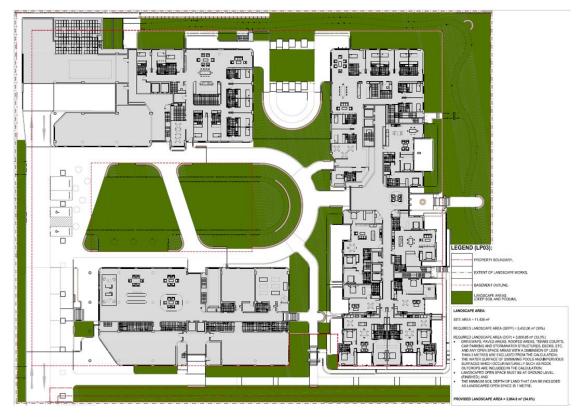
Proposed Landscaped Area (Source: Paddock Landscape Architects)
